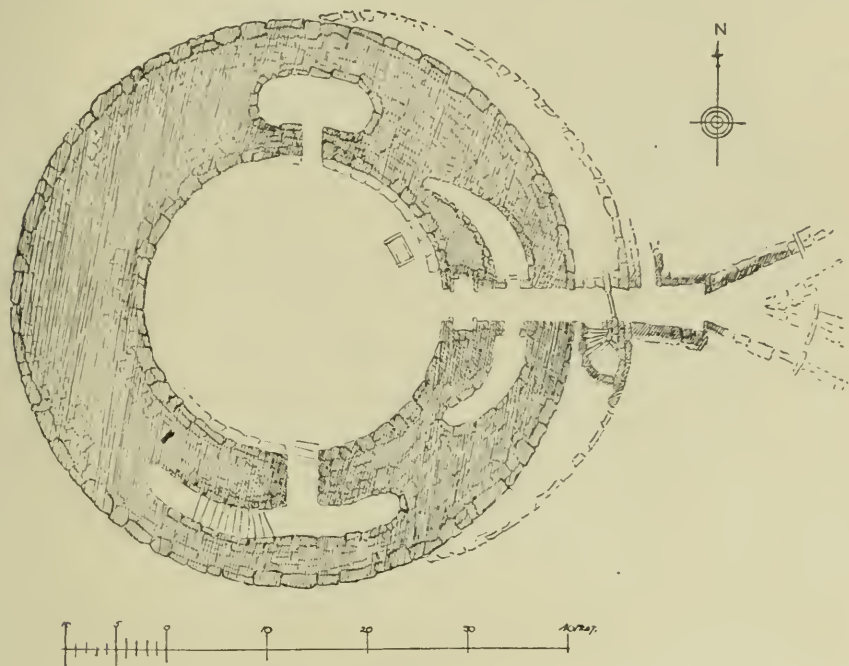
Broch, Hillhead, Broadhaven (No. 520); Ground-plan.
